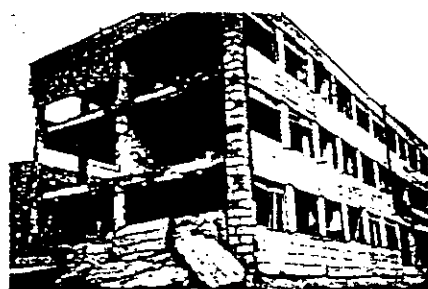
Exterior of Damaged School, Spitak, Armenia (Lindbergh, 1989)
